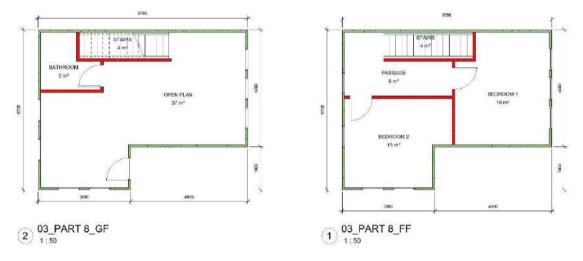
Ground and first floor plan of IBT system 8 scenarios (By Author, 2023)
